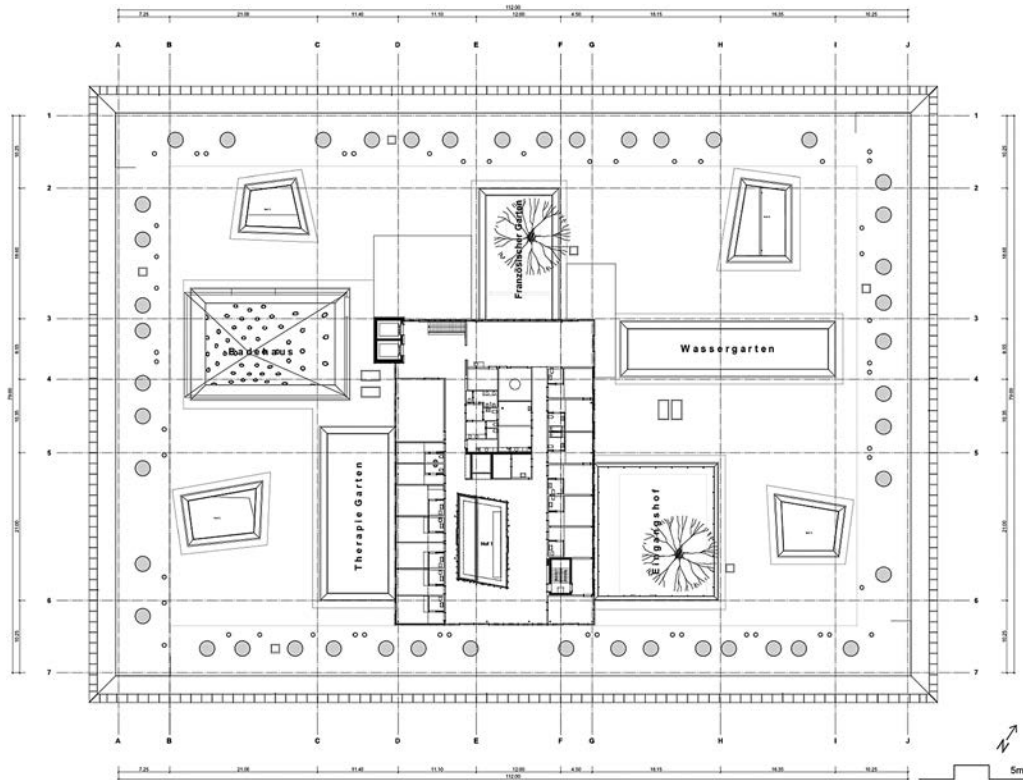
Roof plan. Source: Copyright © Herzog & de Meuron
